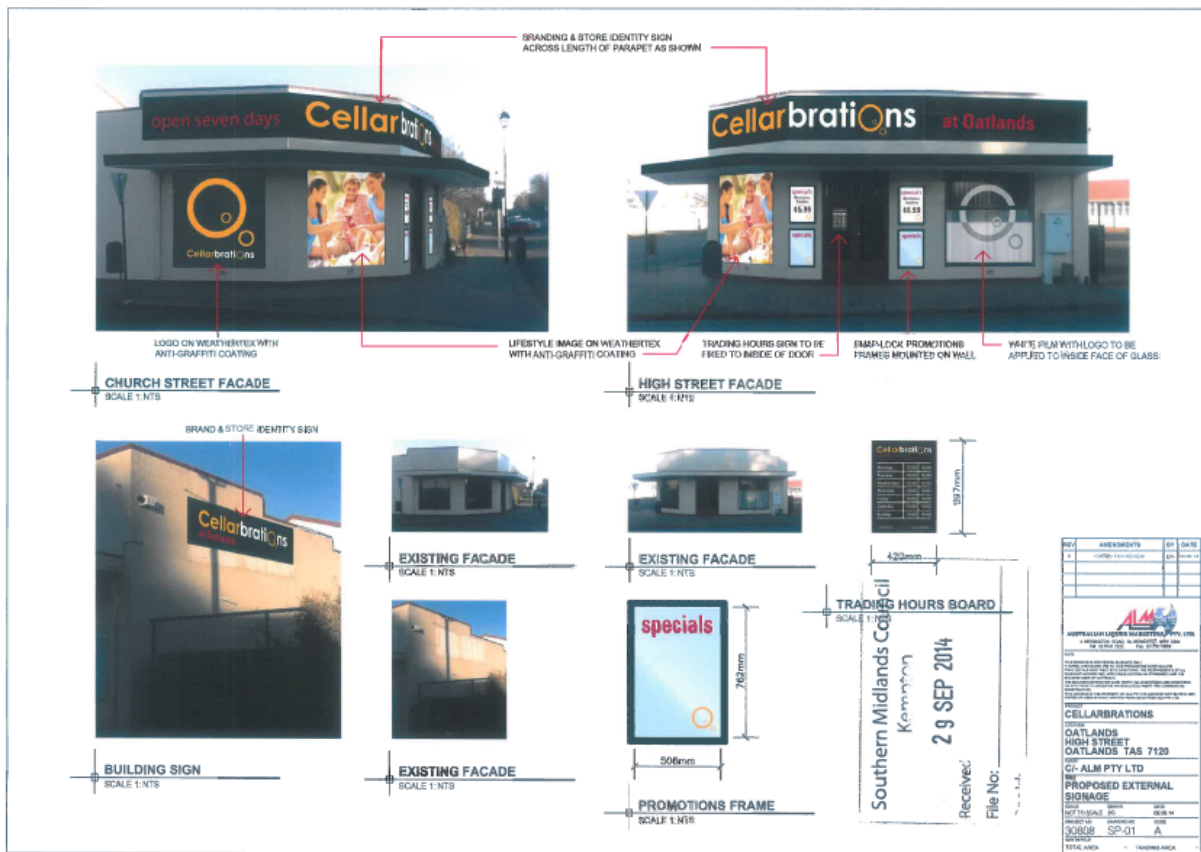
Earlier Signage Plan submitted to Council – not publicly advertised.
